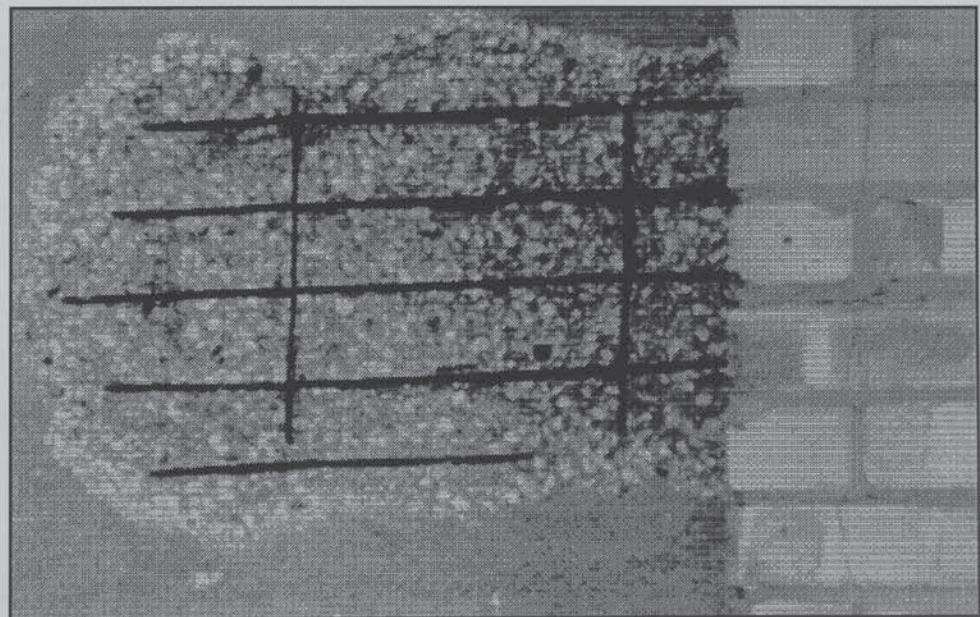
Surface spalling of concrete slab exposing steel reinforcement
